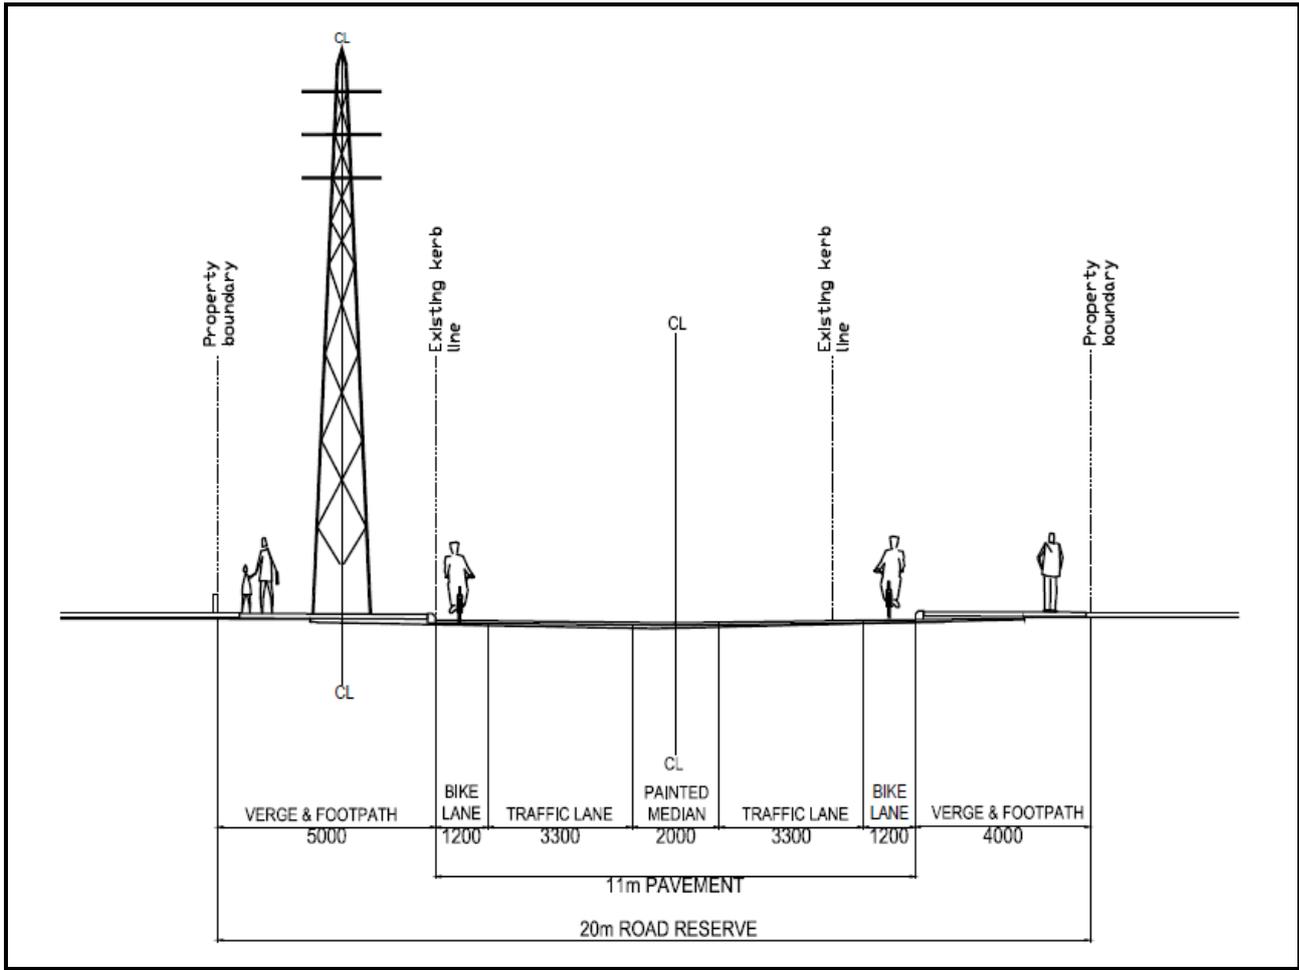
Hamilton Road South of Ocean Road Cross Section (Uloth, 2011)
